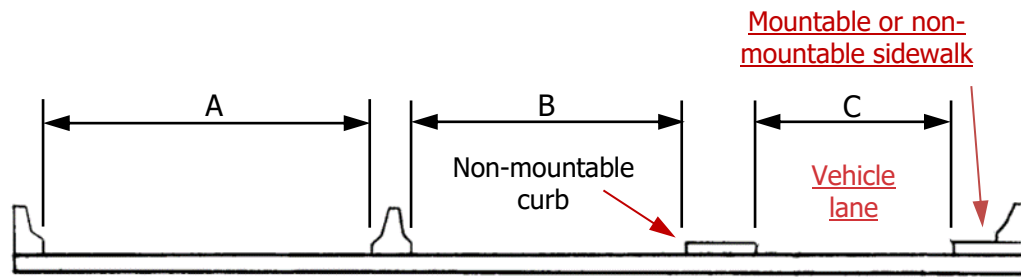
Cross-section view of a bridge deck with non-mountable curb and median barrier.
